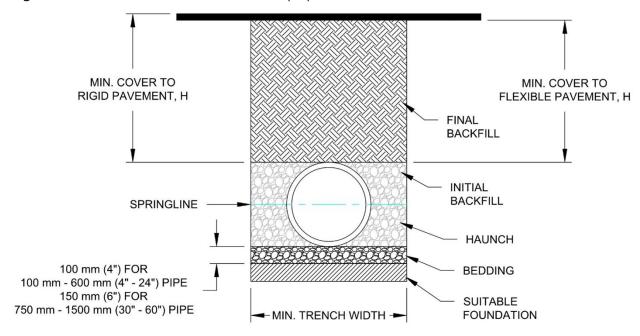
ADS N-12, N-12 ST, and N-12 WT Pipe per CSA B182.8 Trench Detail Under Pavement
